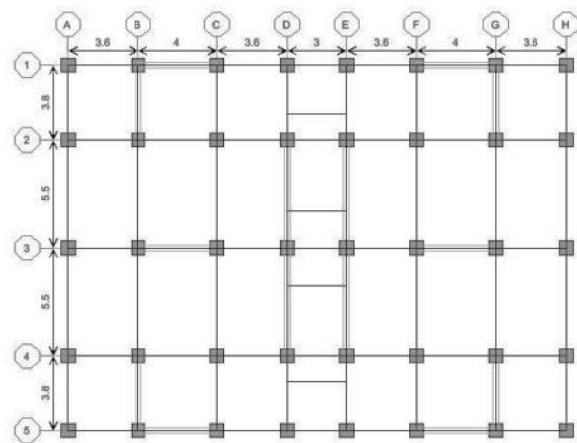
First to fifth Floor Plan (ST 1 to 5)
